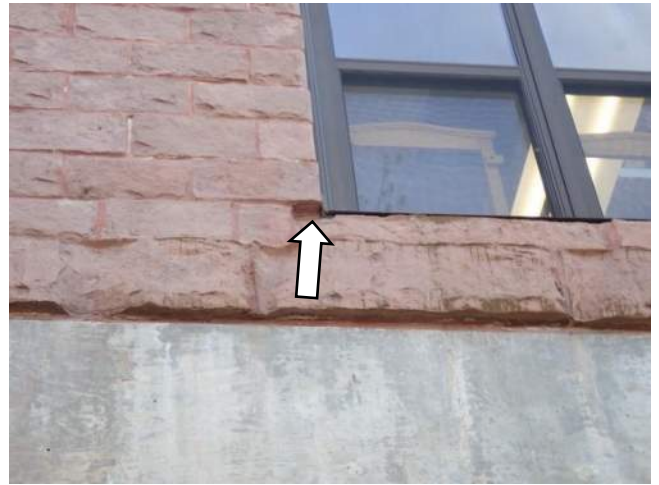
Isolated spalls at a window sill.
